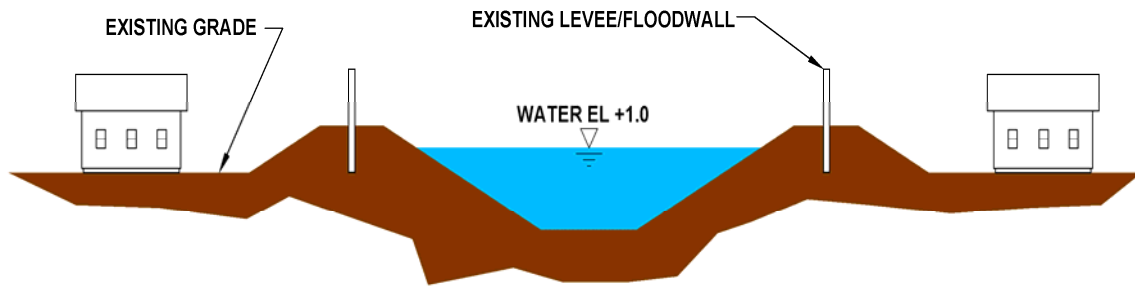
Option 1 Typical Canal Cross Section
